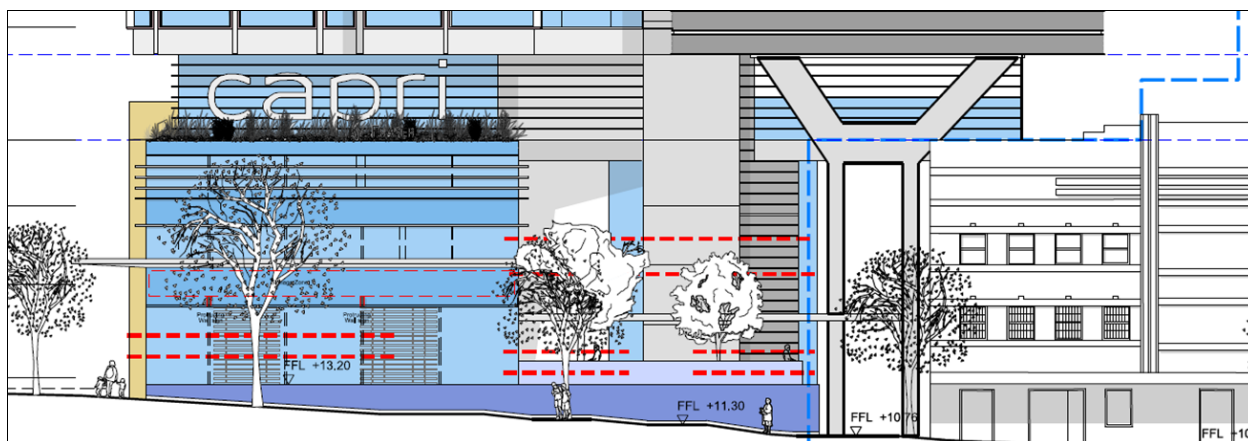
Example of hotel signage lettering within the proposed signage zone on the Broadway (northern) elevation (Source: applicant's EIS)
